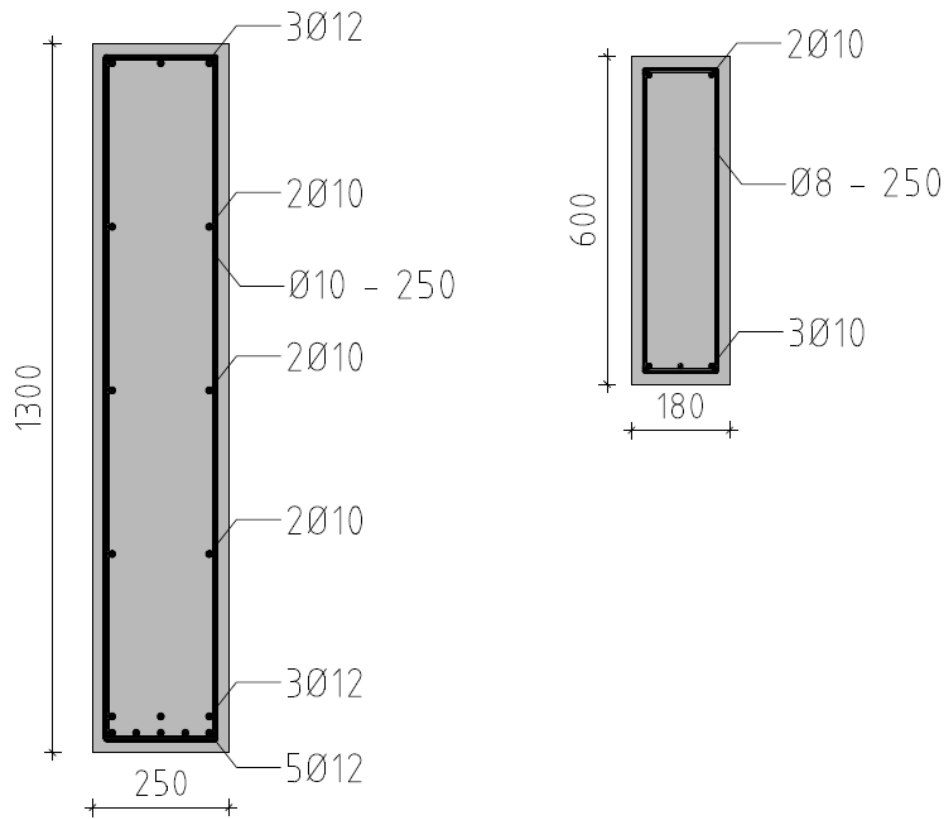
The beam cross sections to left beam 1 and to right beam 2
